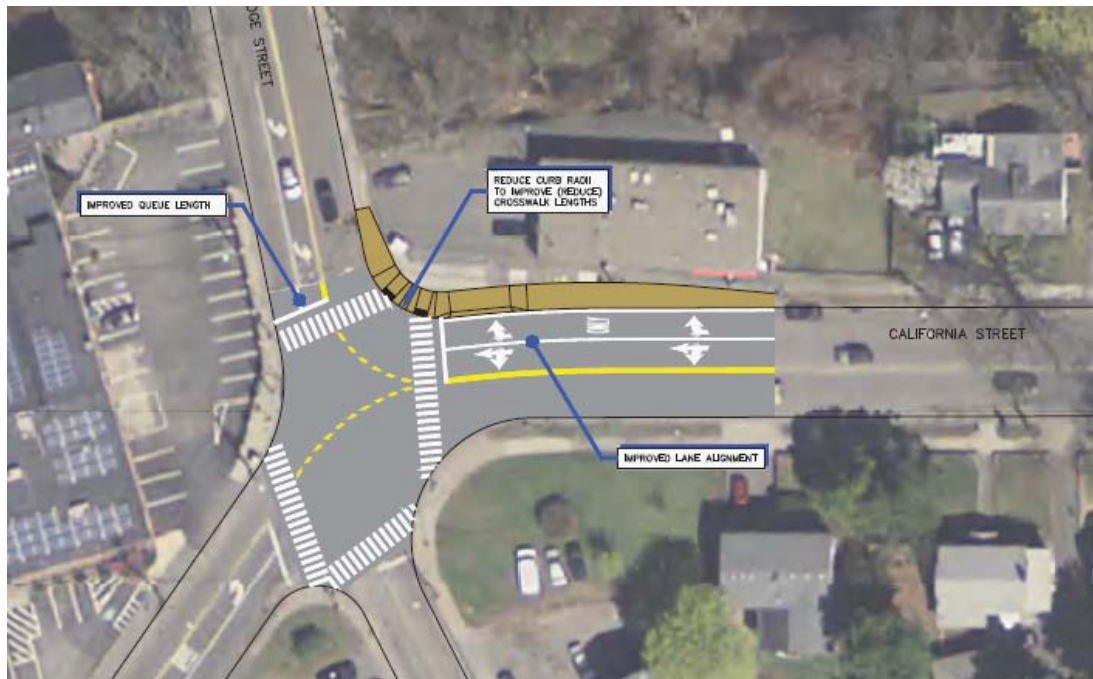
Conceptual Improvements, California Street and Los Angeles Street
